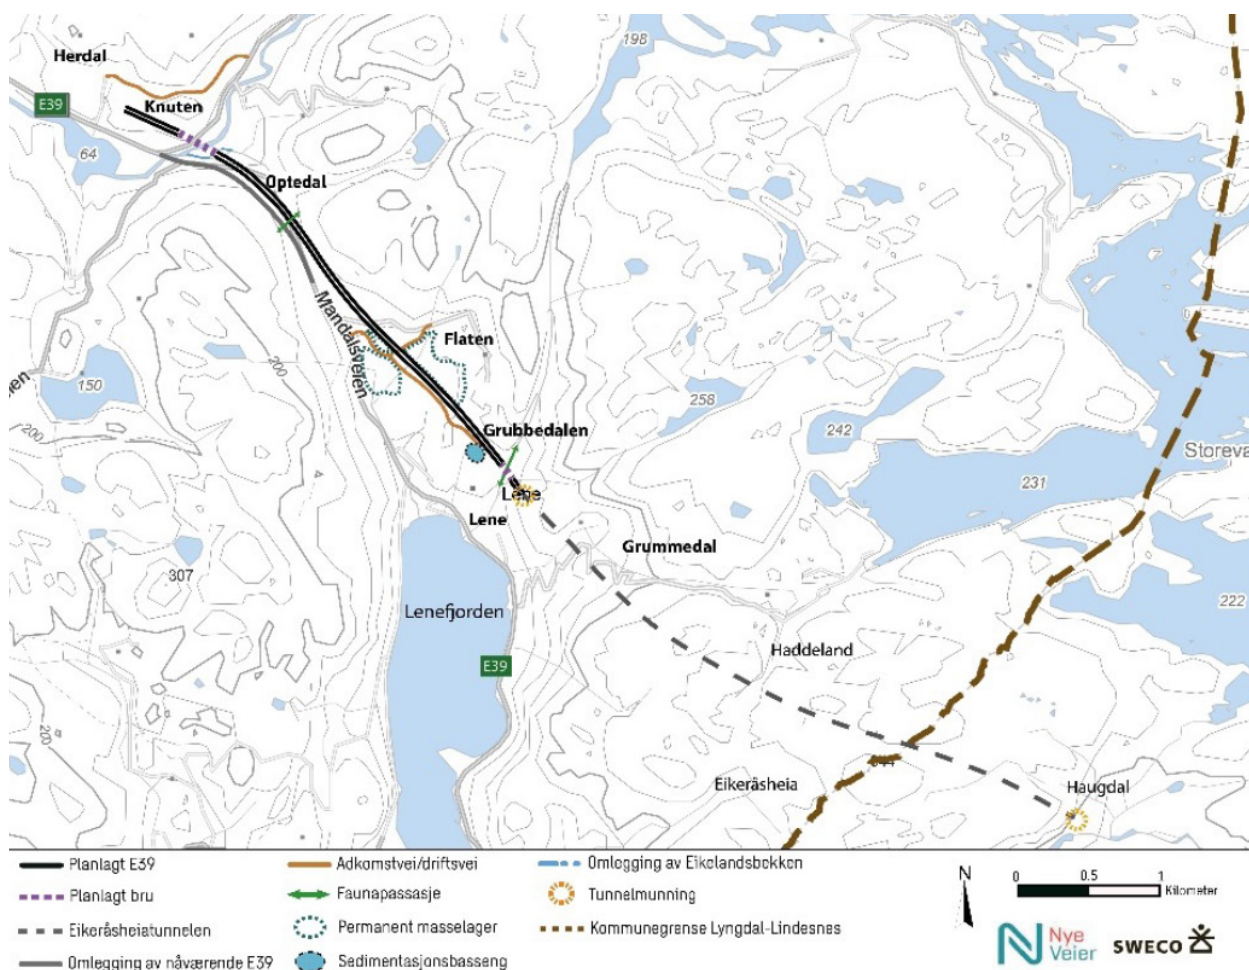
Project and extended tunnel. The figure shows the project in Lyngdal Municipality. Between the Grummedal and Lene farms, the tunnel was extended approx. 500 metres in the detailed zoning plan.
